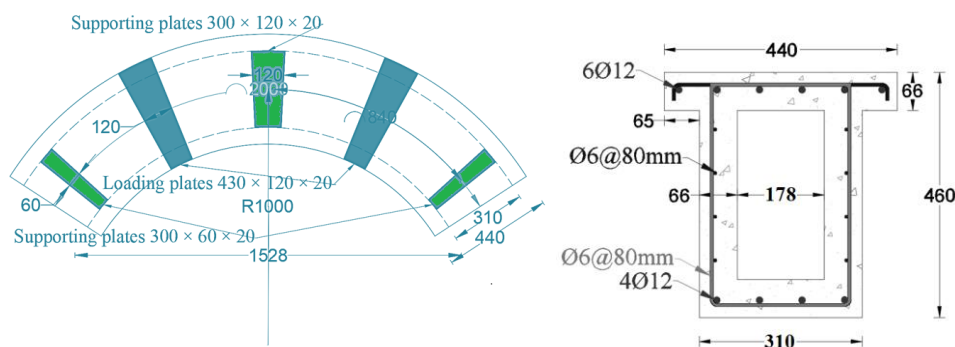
Cross-sectional and longitudinal dimensions of curved box girder
